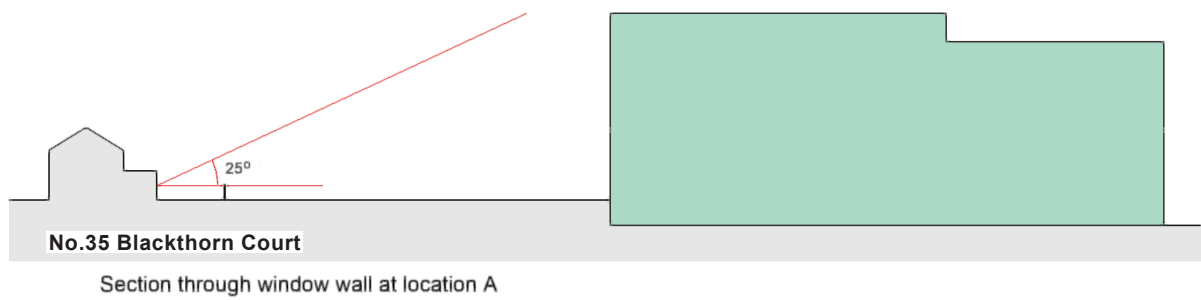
Section perpendicular to window wall at locations indicated in Figure 2.
